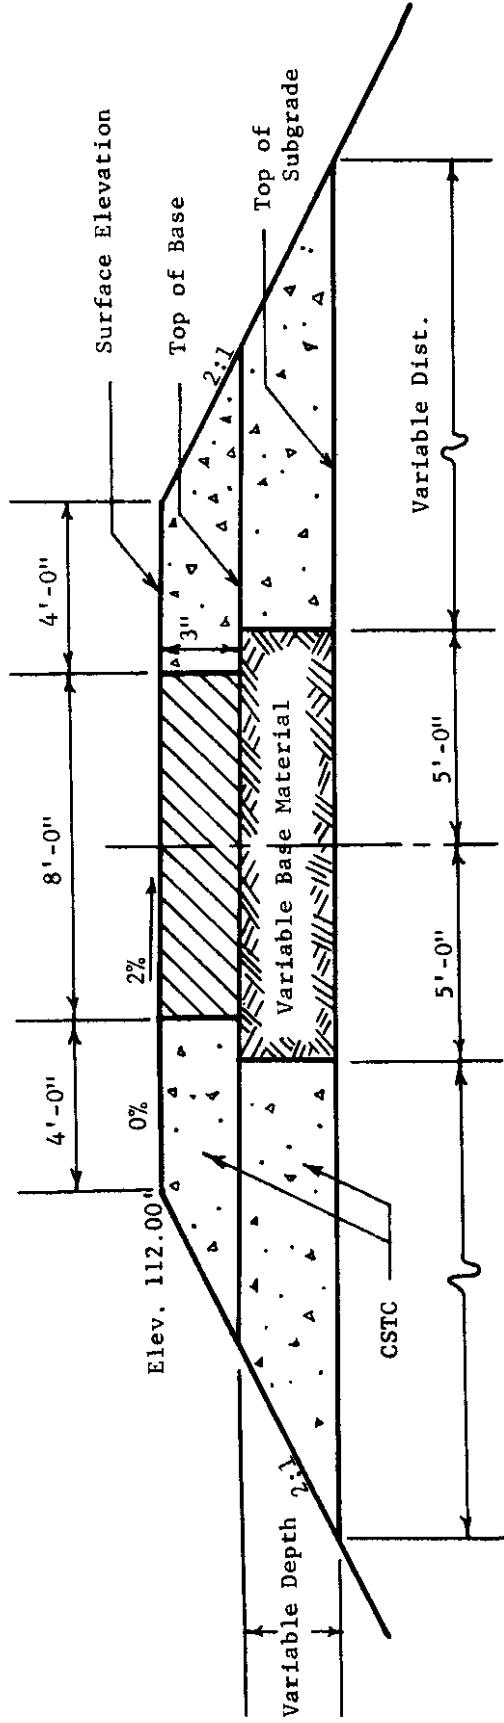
TYPICAL CROSS-SECTION OF PAVEMENT STRUCTURE
